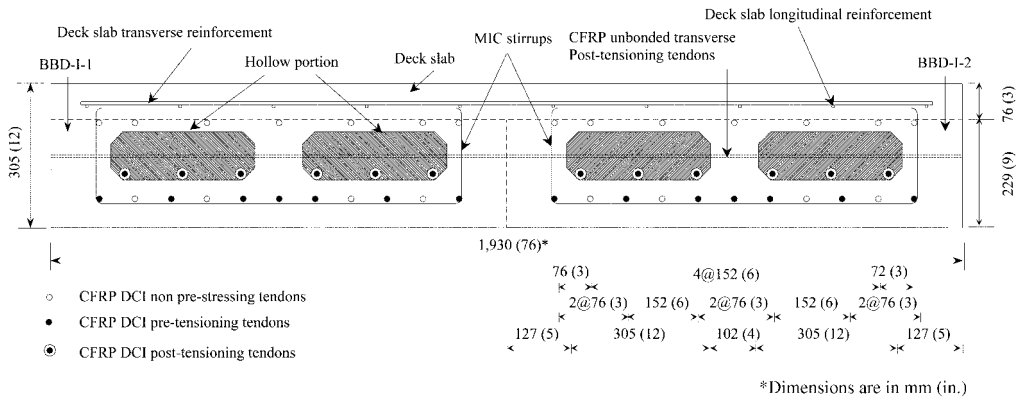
Details of cross section of adjacent CFRP-DCI prestressed box-beam Bridge Model BBD-I.
